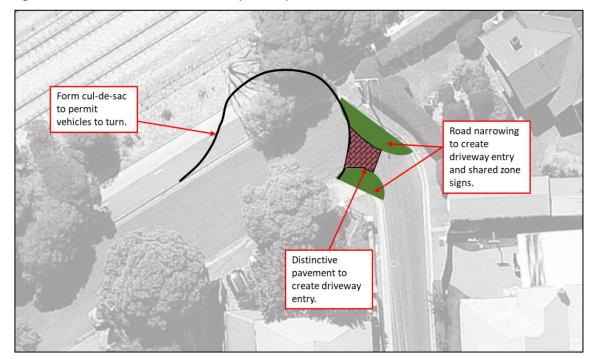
Cul-de-sac & Shared Zone Entry Concept
